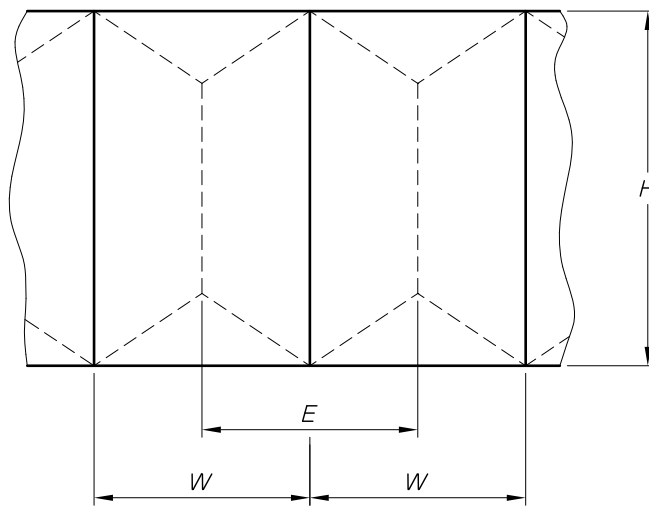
ELEVATION VIEW OF GLAZING PANELS TALLER THAN THEIR WIDTH
